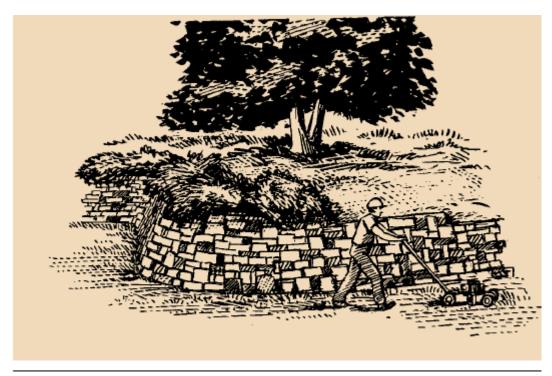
Attractive retaining walls can be used to limit the size of fill and cut slopes, increasing the size of a tree's protection zone.
